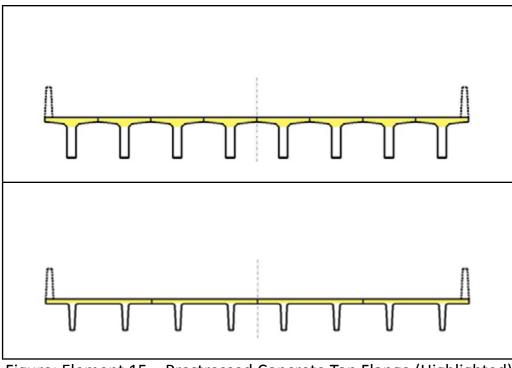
Prestressed Concrete Top Flange (Highlighted)
